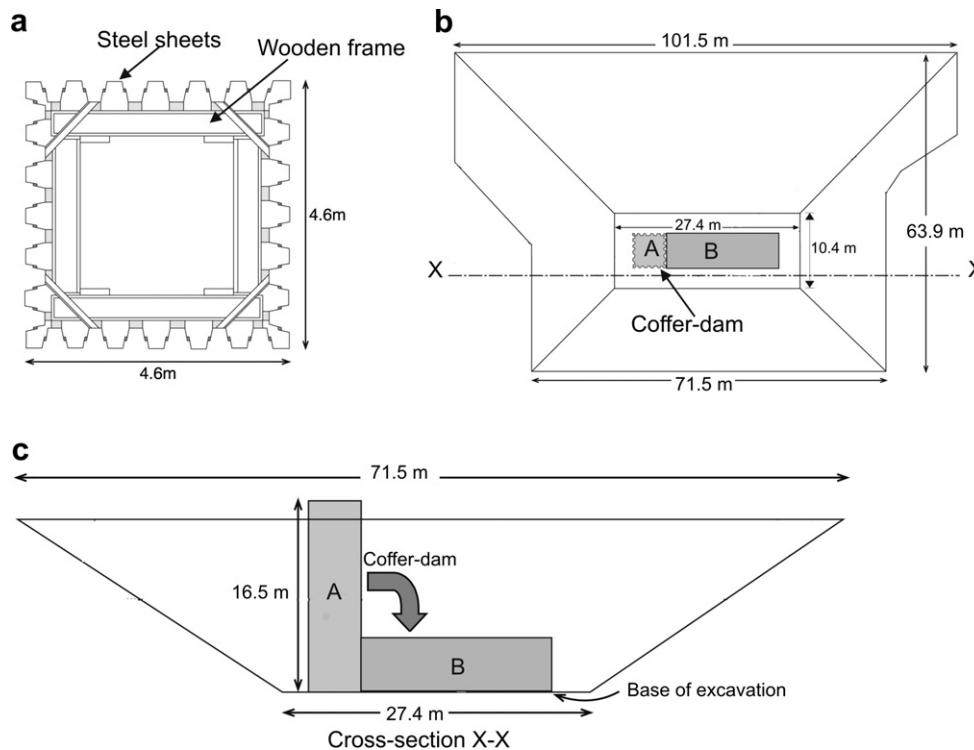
Engineering drawings of the coffer-dam and the excavated trench. (a) The square cross-section of the coffer-dam with a side-length of 4.6 m. It was constructed from steel sheets which are reinforced with a wooden frame. (b) A map view of the excavated trench with the coffer-dam in both its original upright position (A) and expected toppled position (B) (c) cross-section X–X highlighted in (b) with the coffer-dam in its original upright position (A) with a height of approximately 16.5 m and toppled position (B). The coffer-dam was buried with sediment after toppling into a semi-horizontal position on the trench base.
